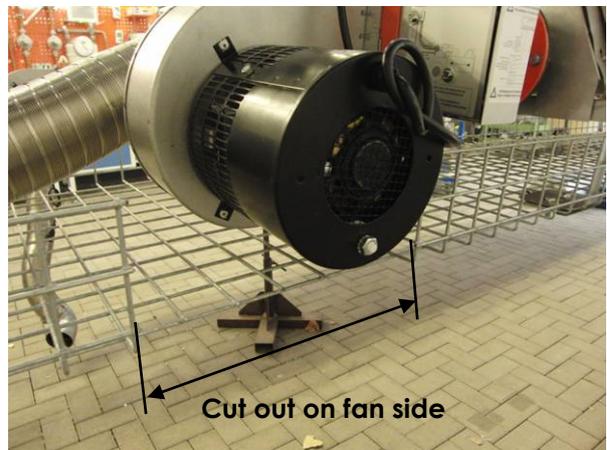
Cut out on fan side for mounting and compensation thermal length expansion - only 50/60kW
